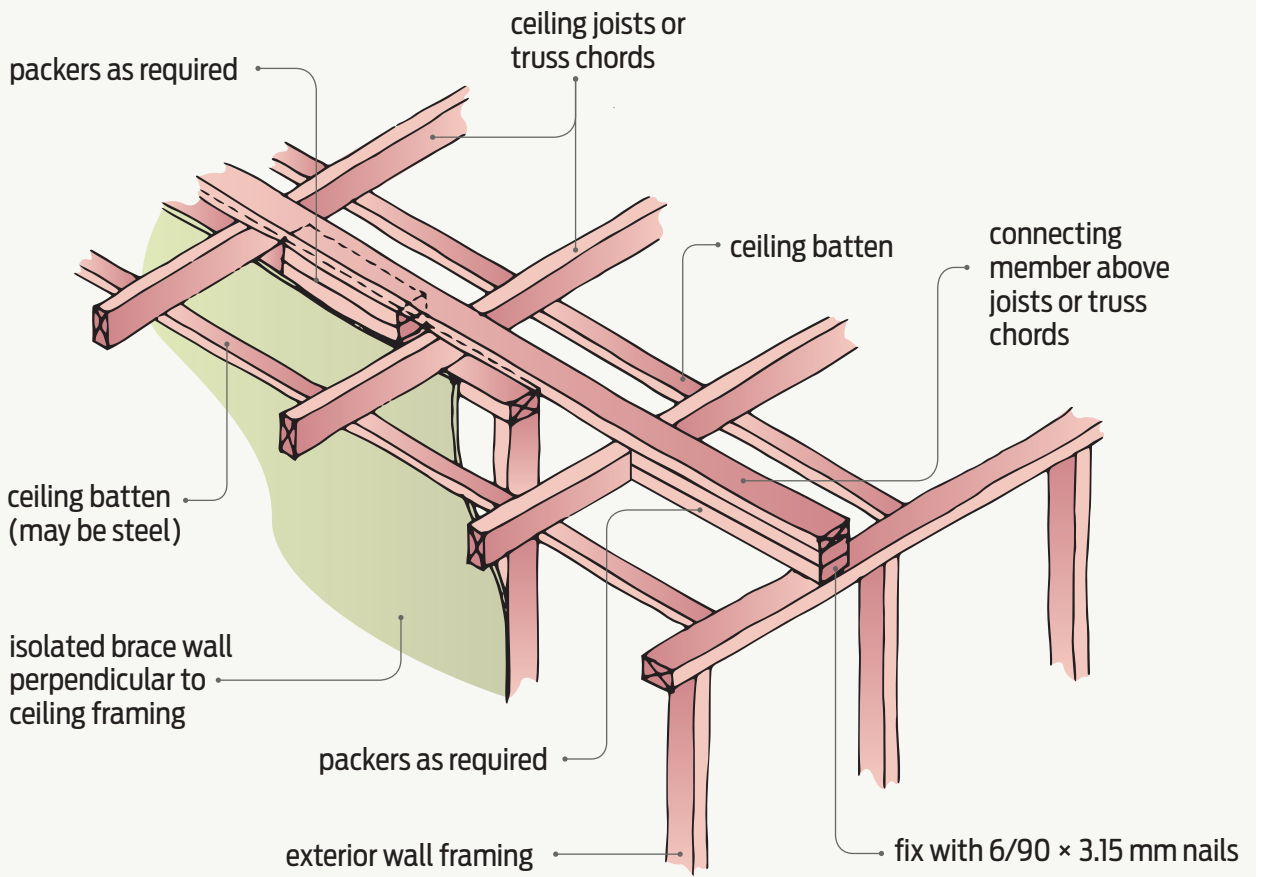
Brace wall connection above ceiling framing when wall is perpendicular to ceiling framing.
